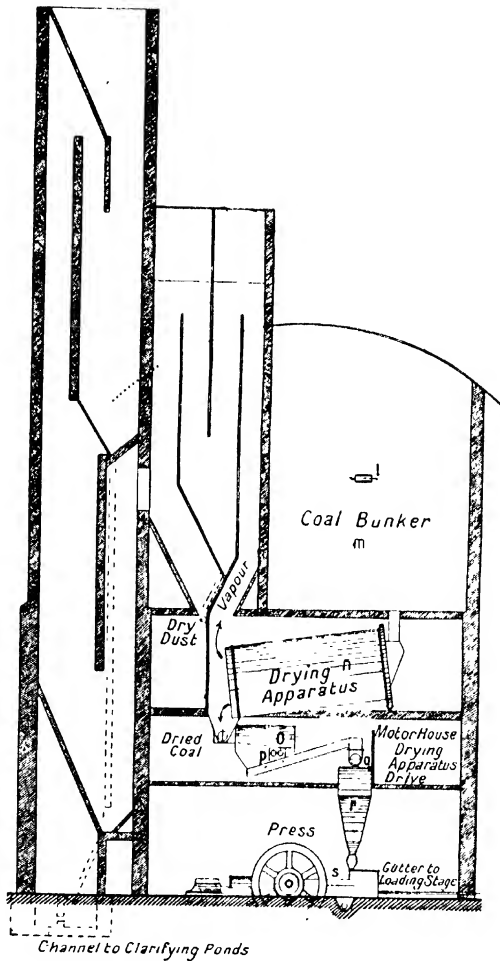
Section through the Lauchhammer briquette factory working with tube driers and electric drive.
